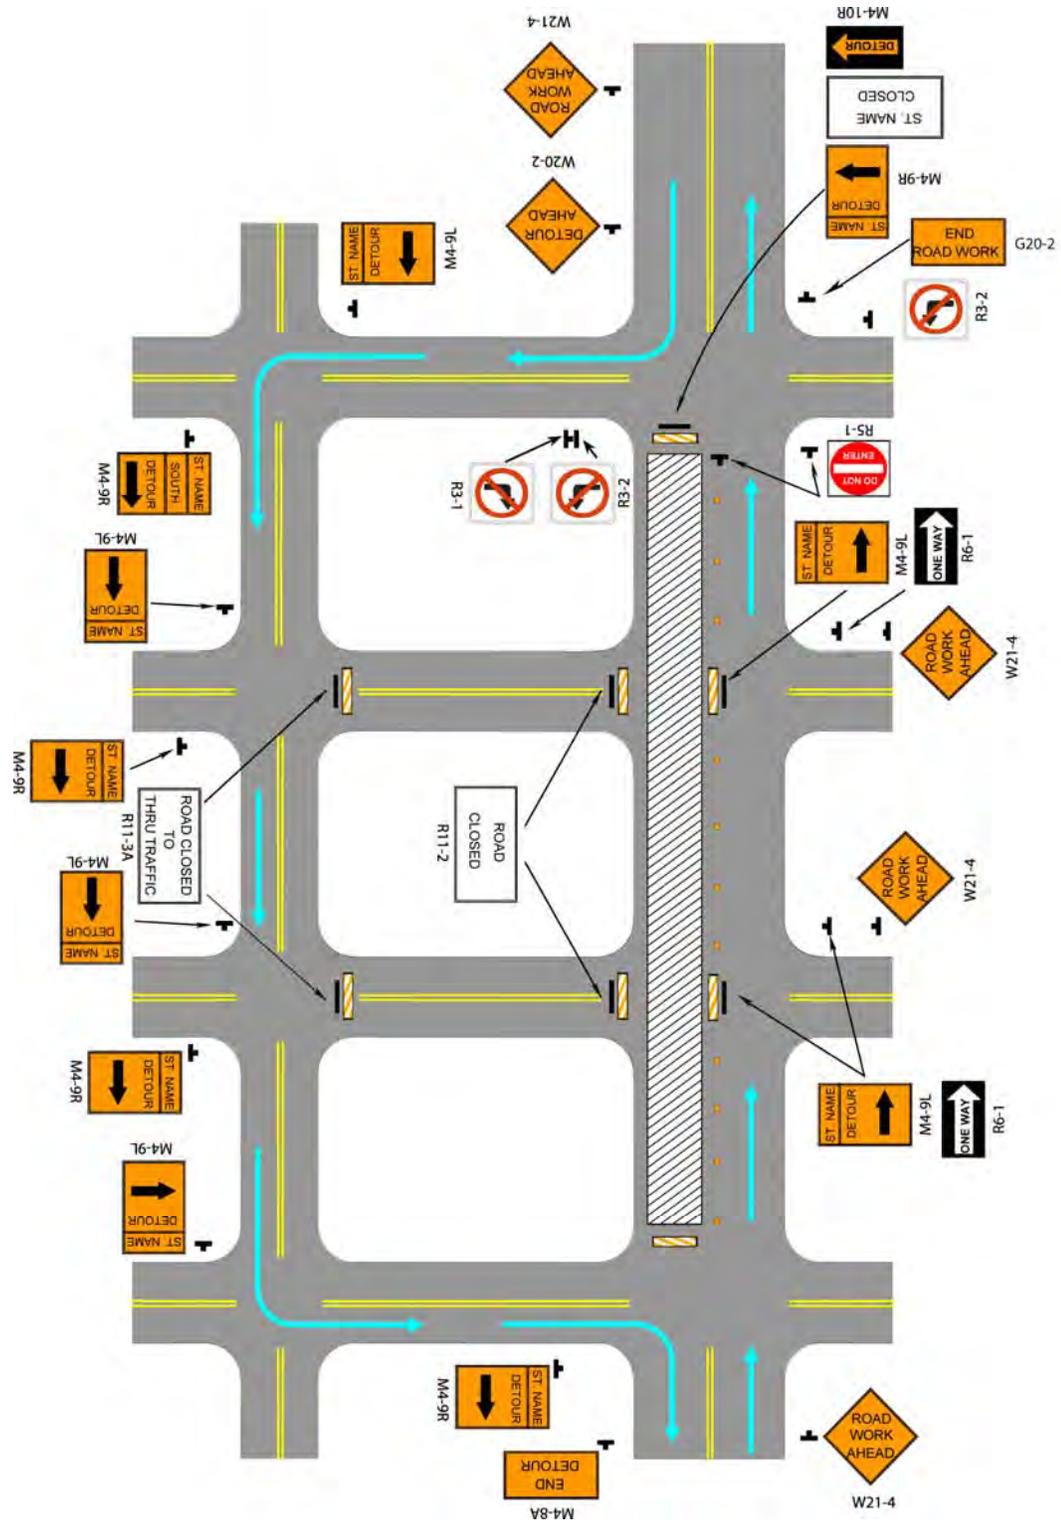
Typical Application: Road Closure and Detour for One Travel Direction
